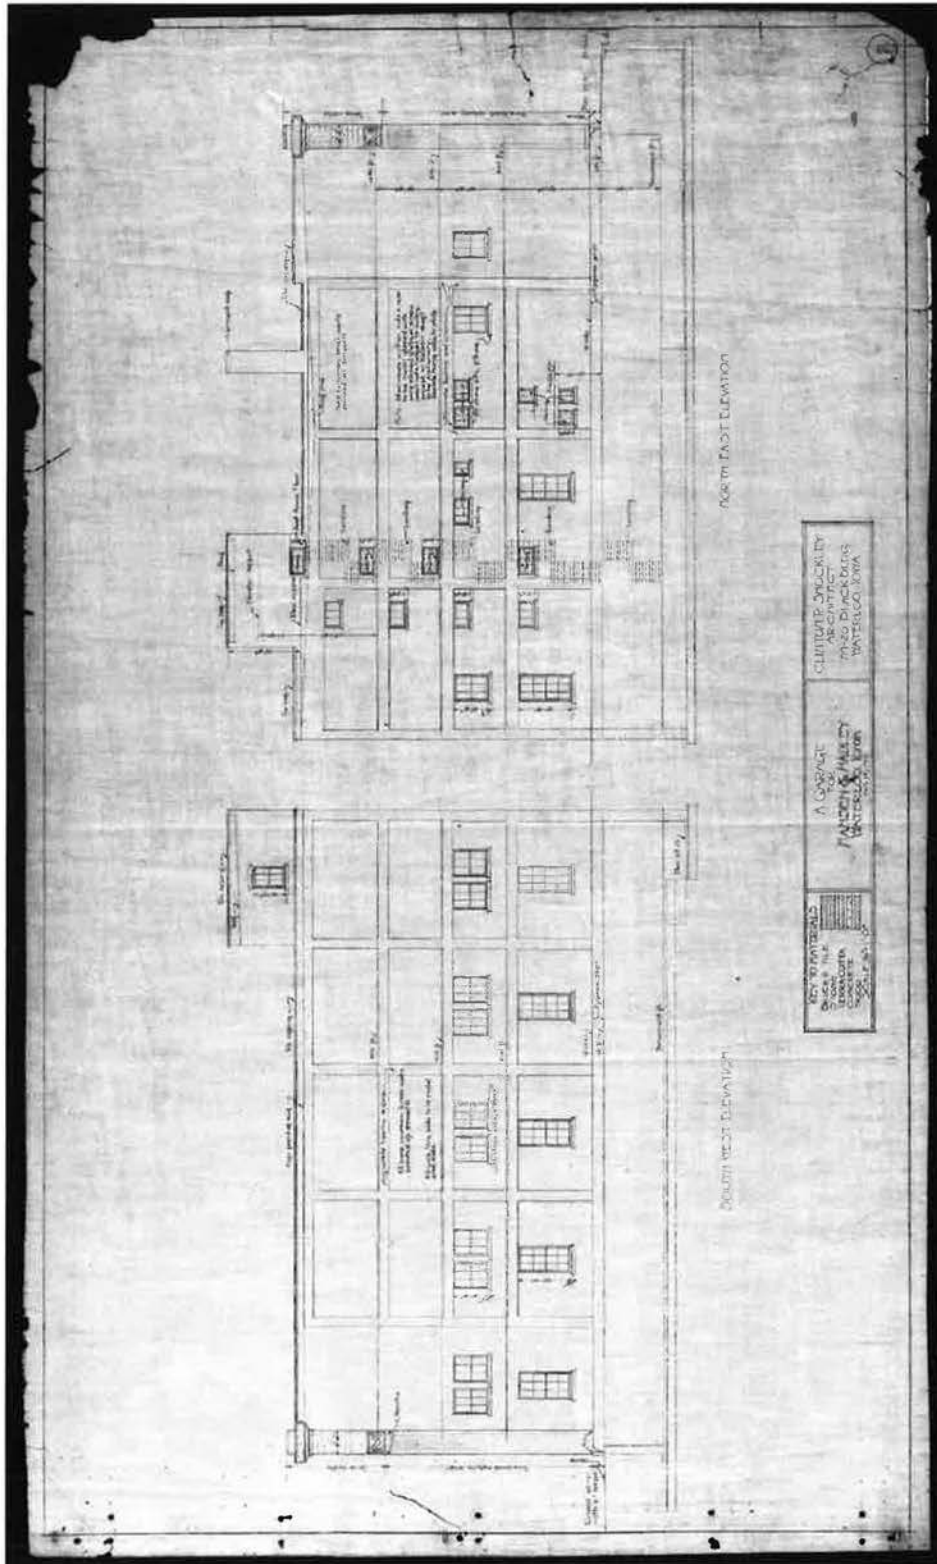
Secondary Facade Elevations (Clinton P. Shockley 1915)
